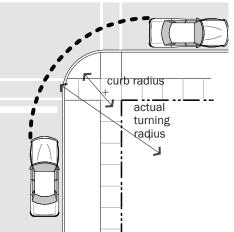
(1). Actual Curb Turn Radius with On-Street Parking.
